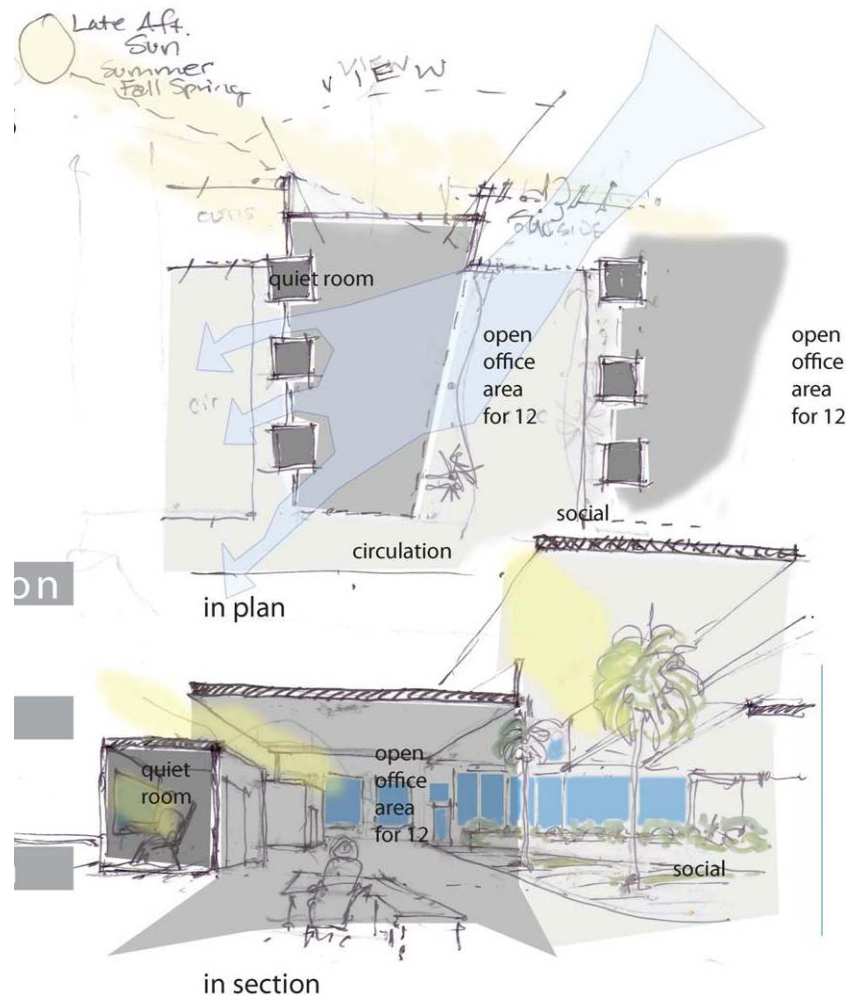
Well-Organized Personal Zones: Concentration at Building Scale, plan and section sketches
